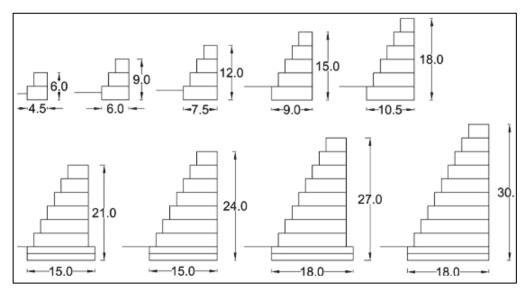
Sample design dimensions and arrangement for Gabion walls
